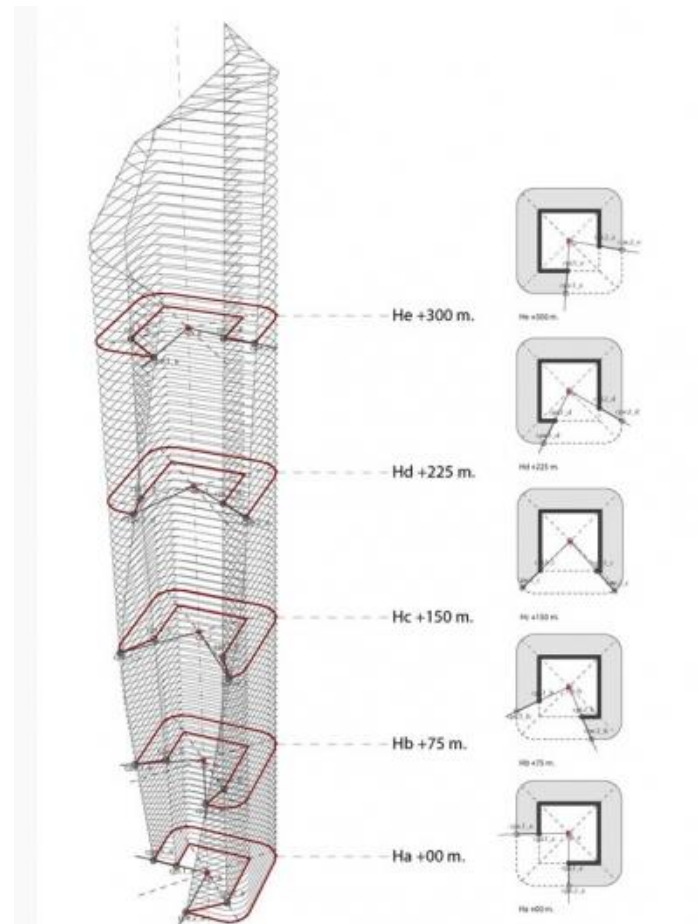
Elimination of floor quadrants to achieve flair wall design [45]
